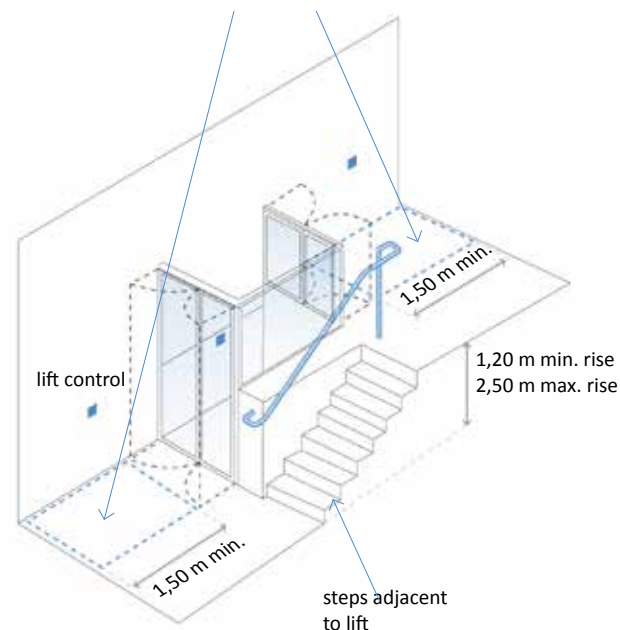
key dimensions of platform lifts, (source: building bulletin 91)
